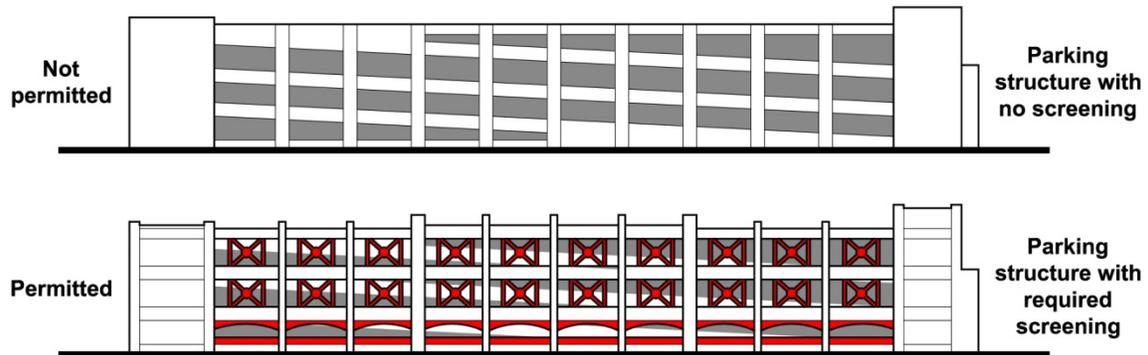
NON-CONFORMING FAÇADE DESIGN (LEFT) AND CONFORMING FACADE DESIGN (RIGHT)
